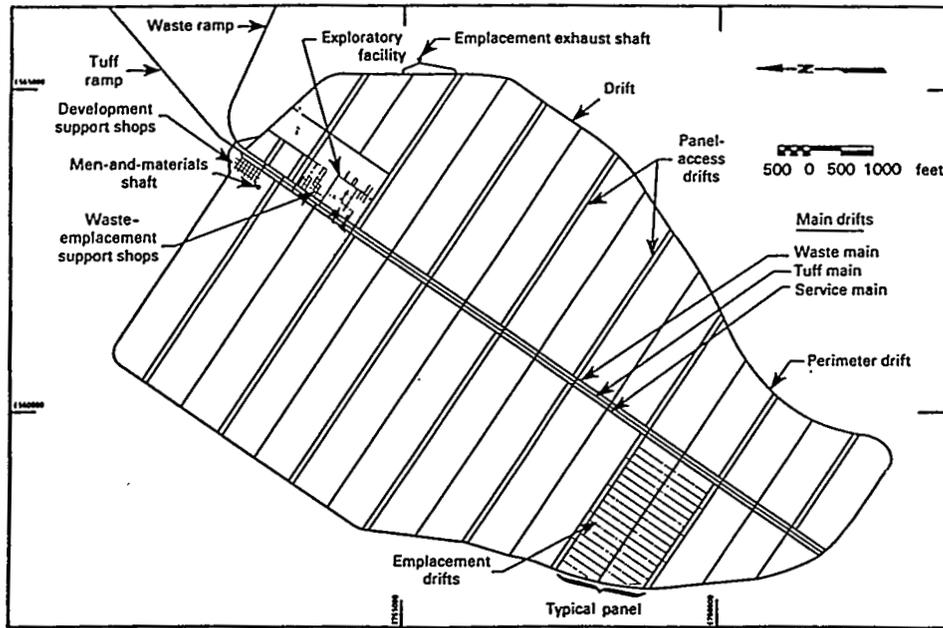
Layout shown in the conceptual design for the underground repository with vertical waste emplacement.
